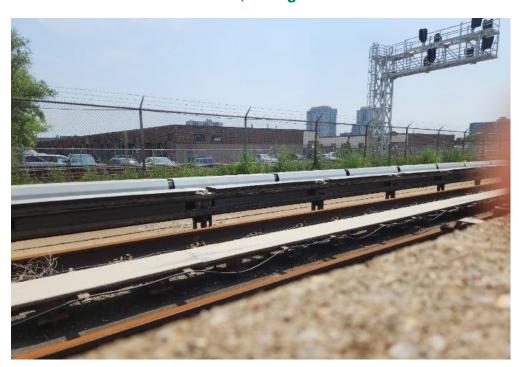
TTC existing Line 3 tracks between Ellesmere and Lawrence Stations, facing south.
